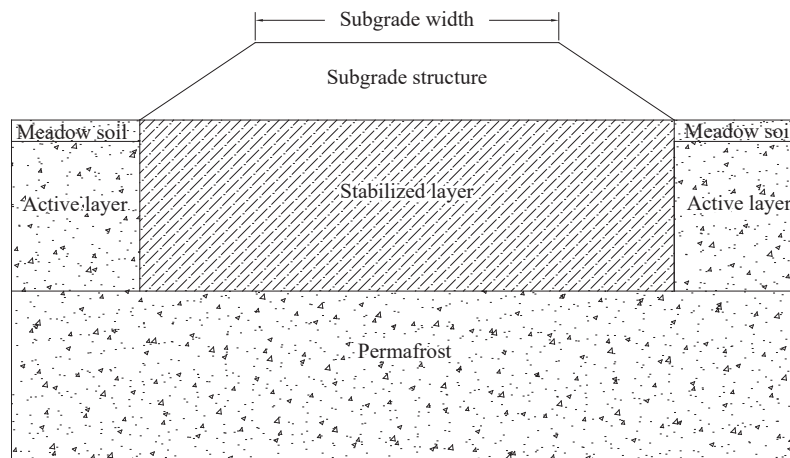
Schematic diagram of shallow in-situ foundation solidification enhancement technology.
